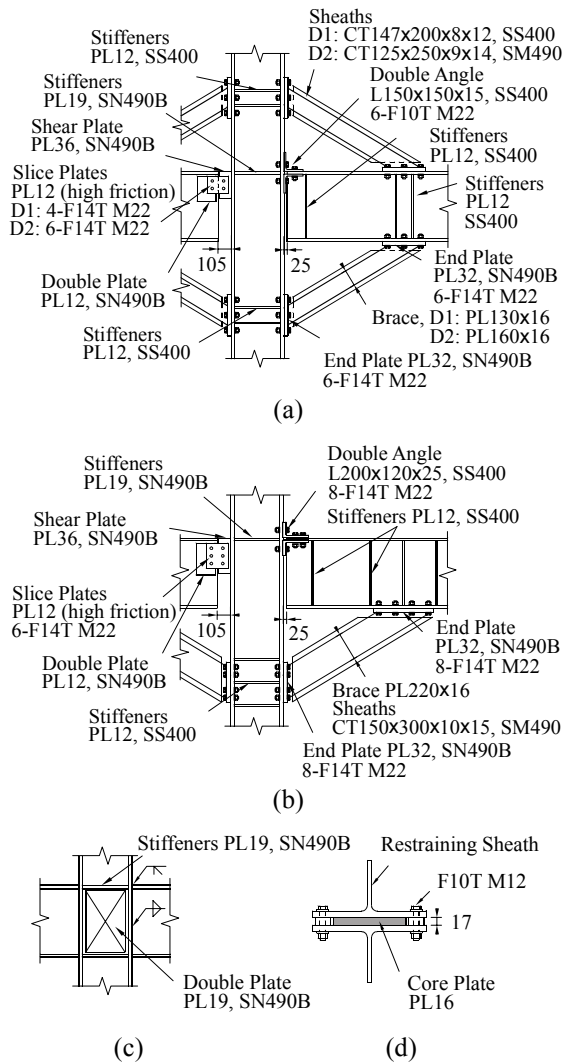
Connection details (unit: mm): (a) specimens D1 and D2; (b) specimen S; (c) specimen W; (d) buckling-restrained brace
